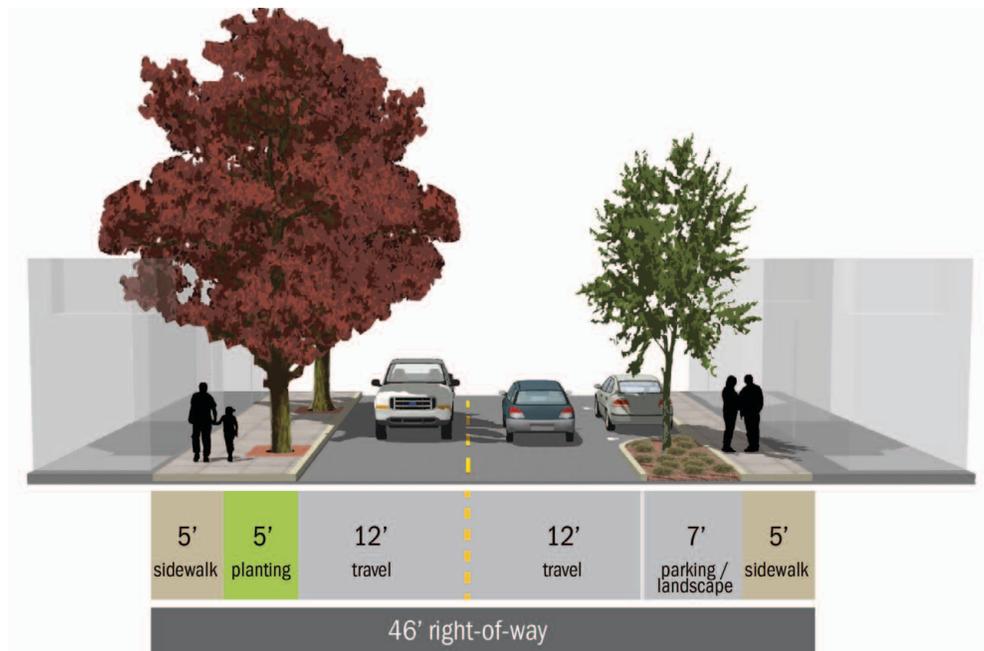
Conceptual Cross-Section for Main Street – North of Beta Street within existing right-of-way
